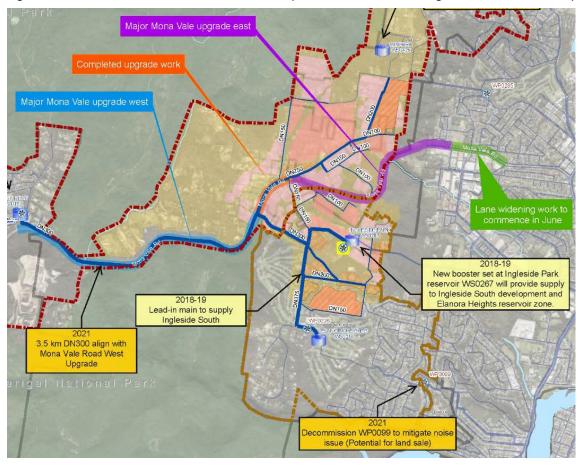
Figure A Preferred water servicing plan (source Ingleside Drinking Water and Wastewater Servicing Options – March 2018)
